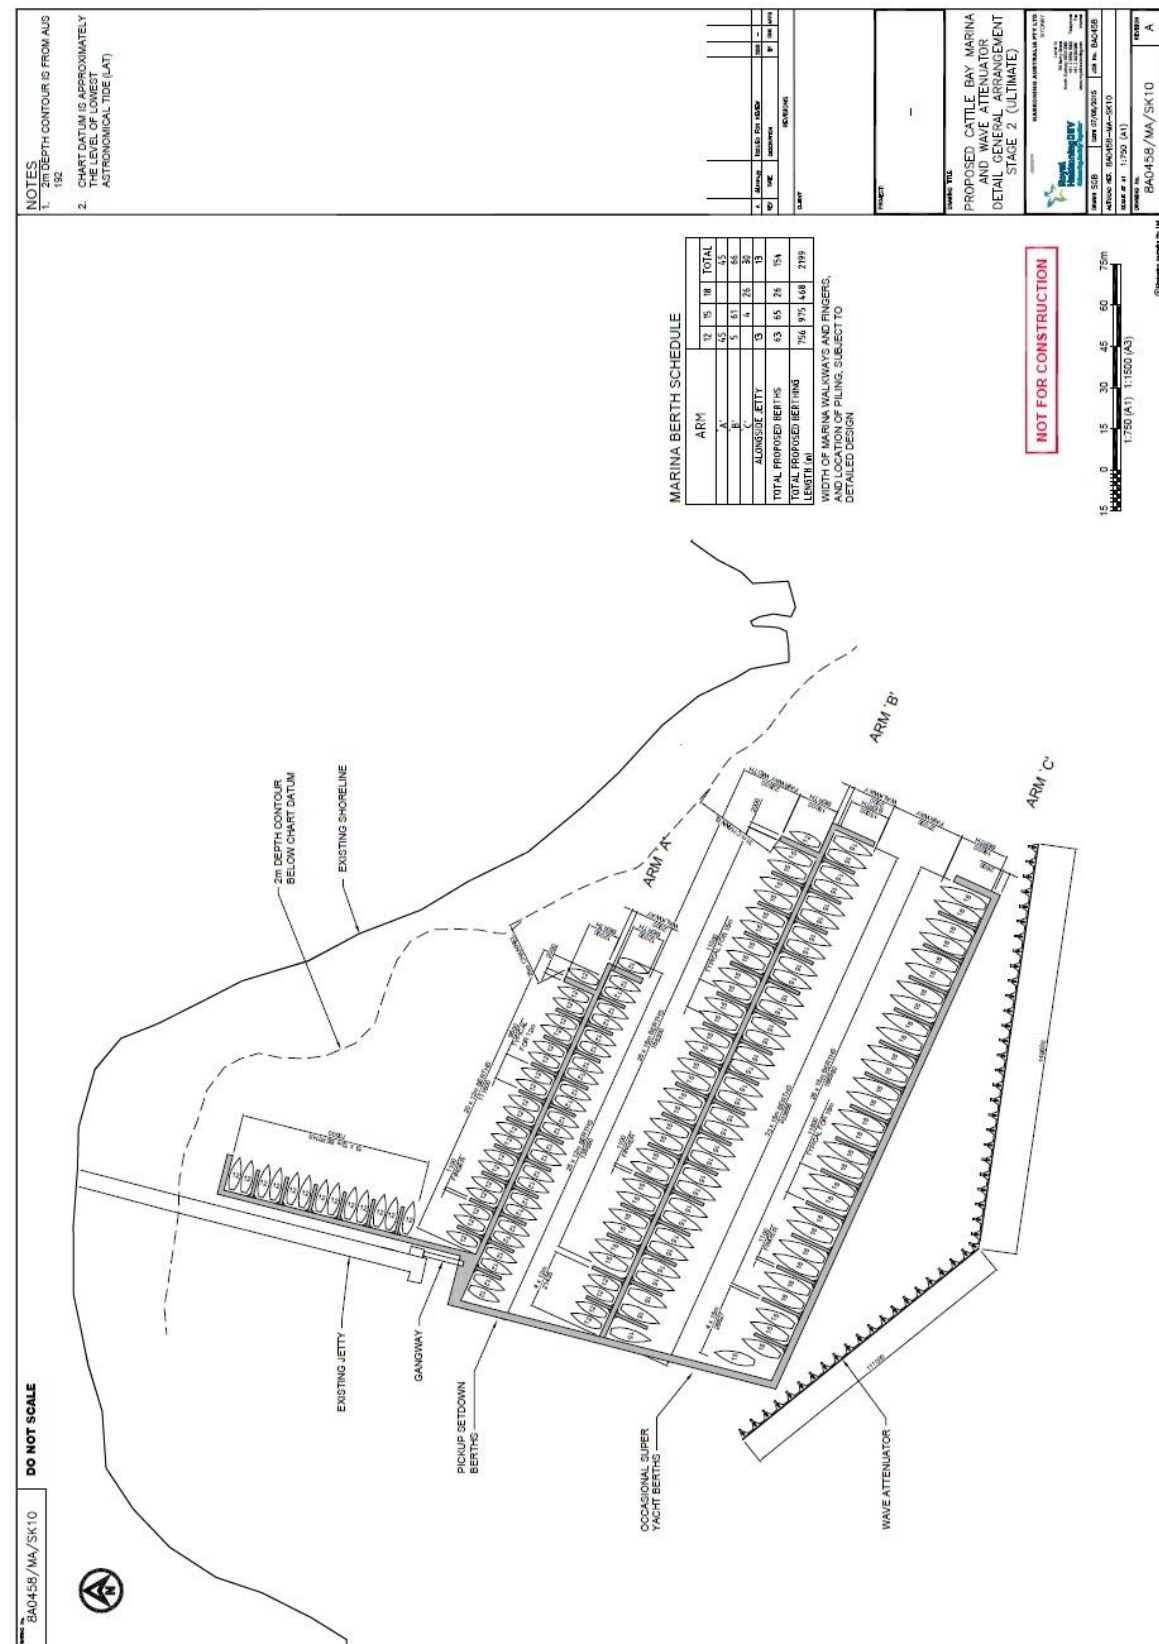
Proposed marina development plan (Stage 2 - water based component)
